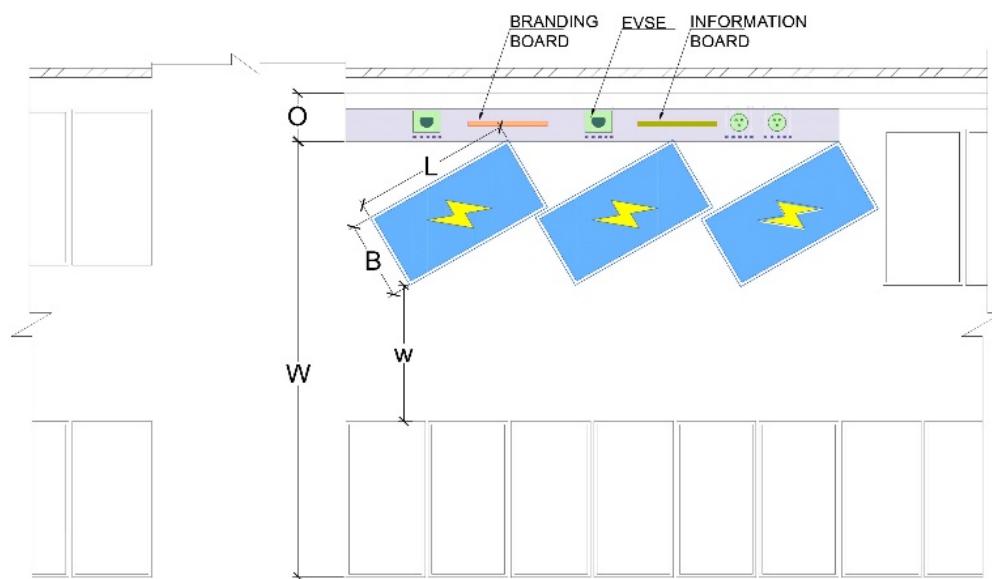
Diagonal off-street charging layout (45-degree angle)
